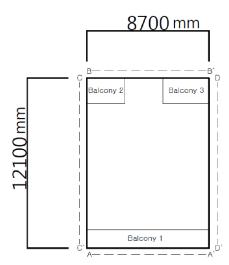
Simplified floor plan of Korean apartment house (modified from Yoo *et al.*, 2002).
